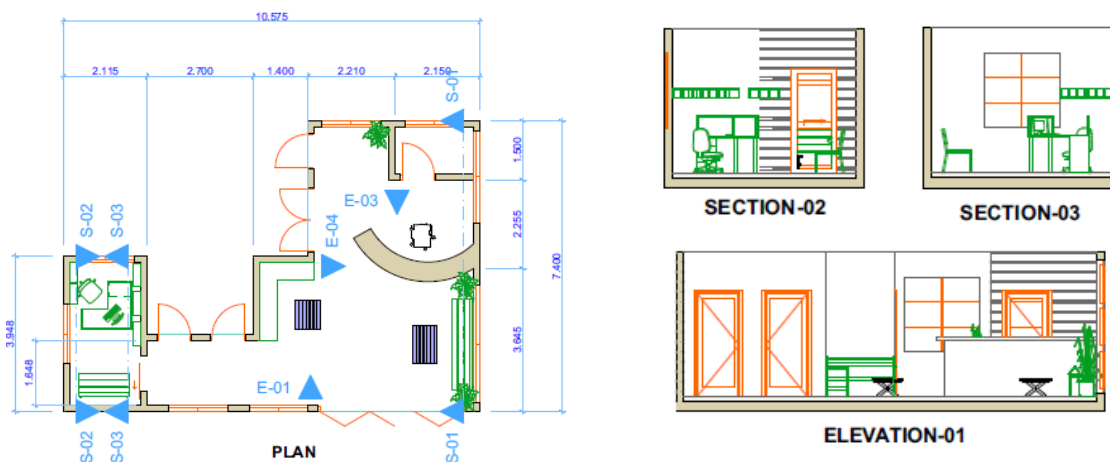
Reception + Manager's Office Plan Elevations and Sections (Image Source: Author)
